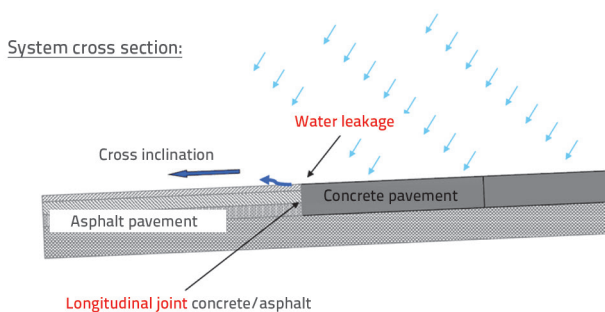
Illustration of water leakage from asphalt-concrete joints [8]
